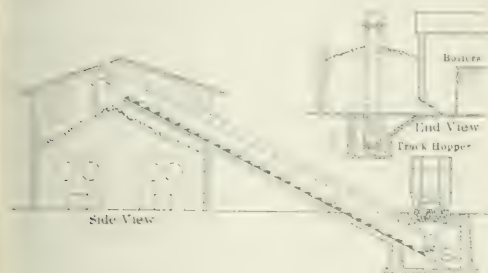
Coal Conveyor for Boiler-Room Storage.
